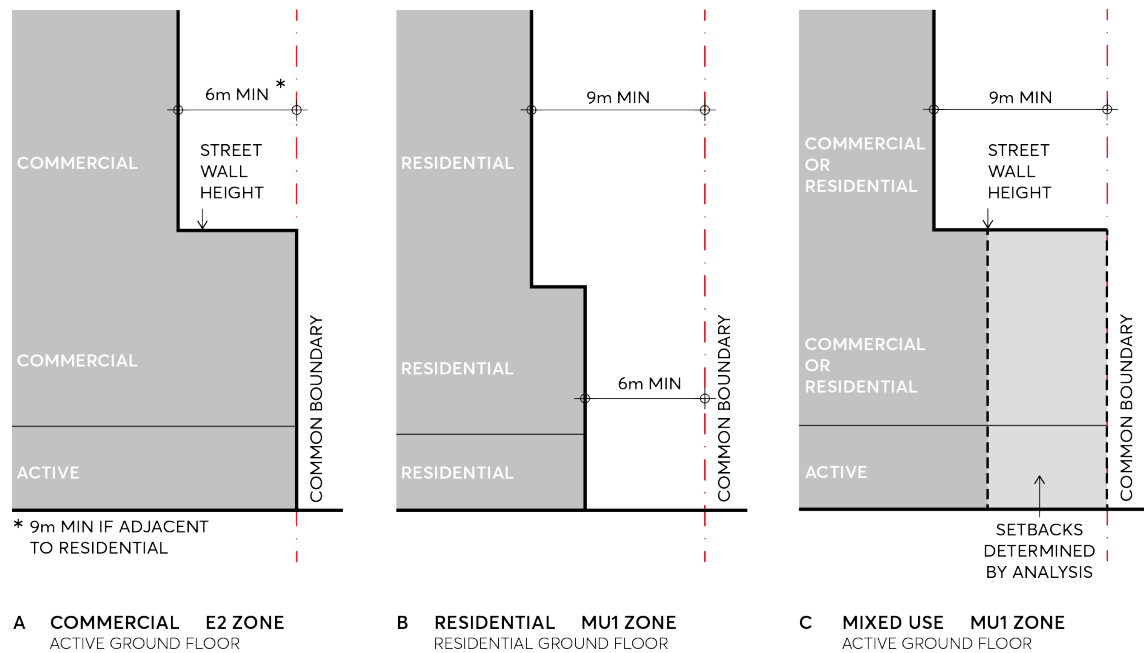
(A, B and C) – Building Separation
